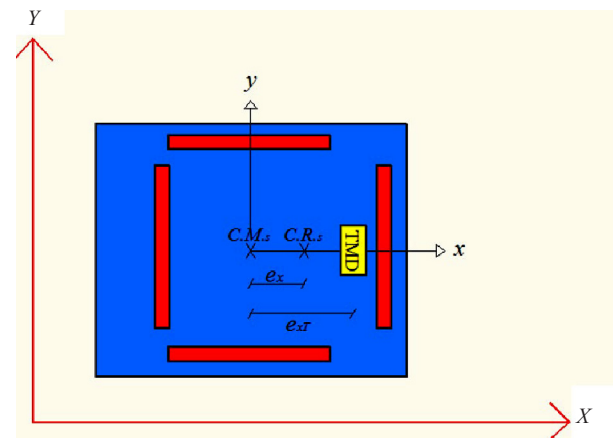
Plan of the one-story building equipped with TMDs; █: structure elements (beams and columns)
